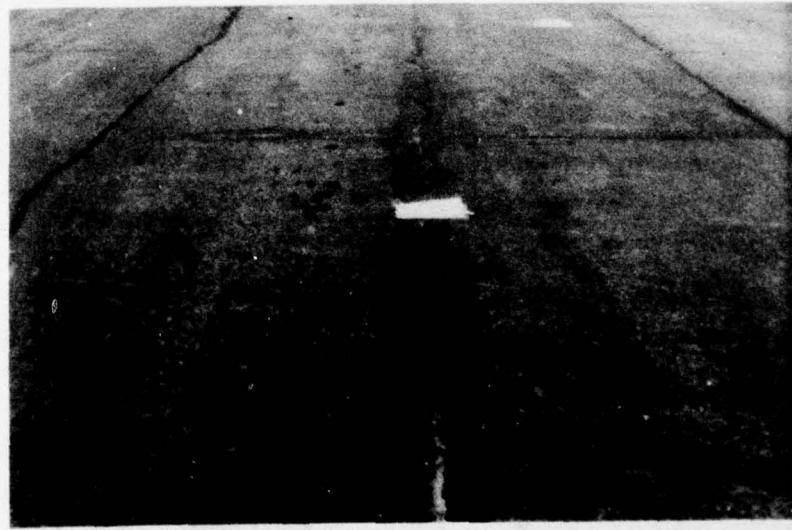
Medium Severity Longitudinal Crack. (Note the Crack Is Reflective But Not at the Joint of Slab.)
